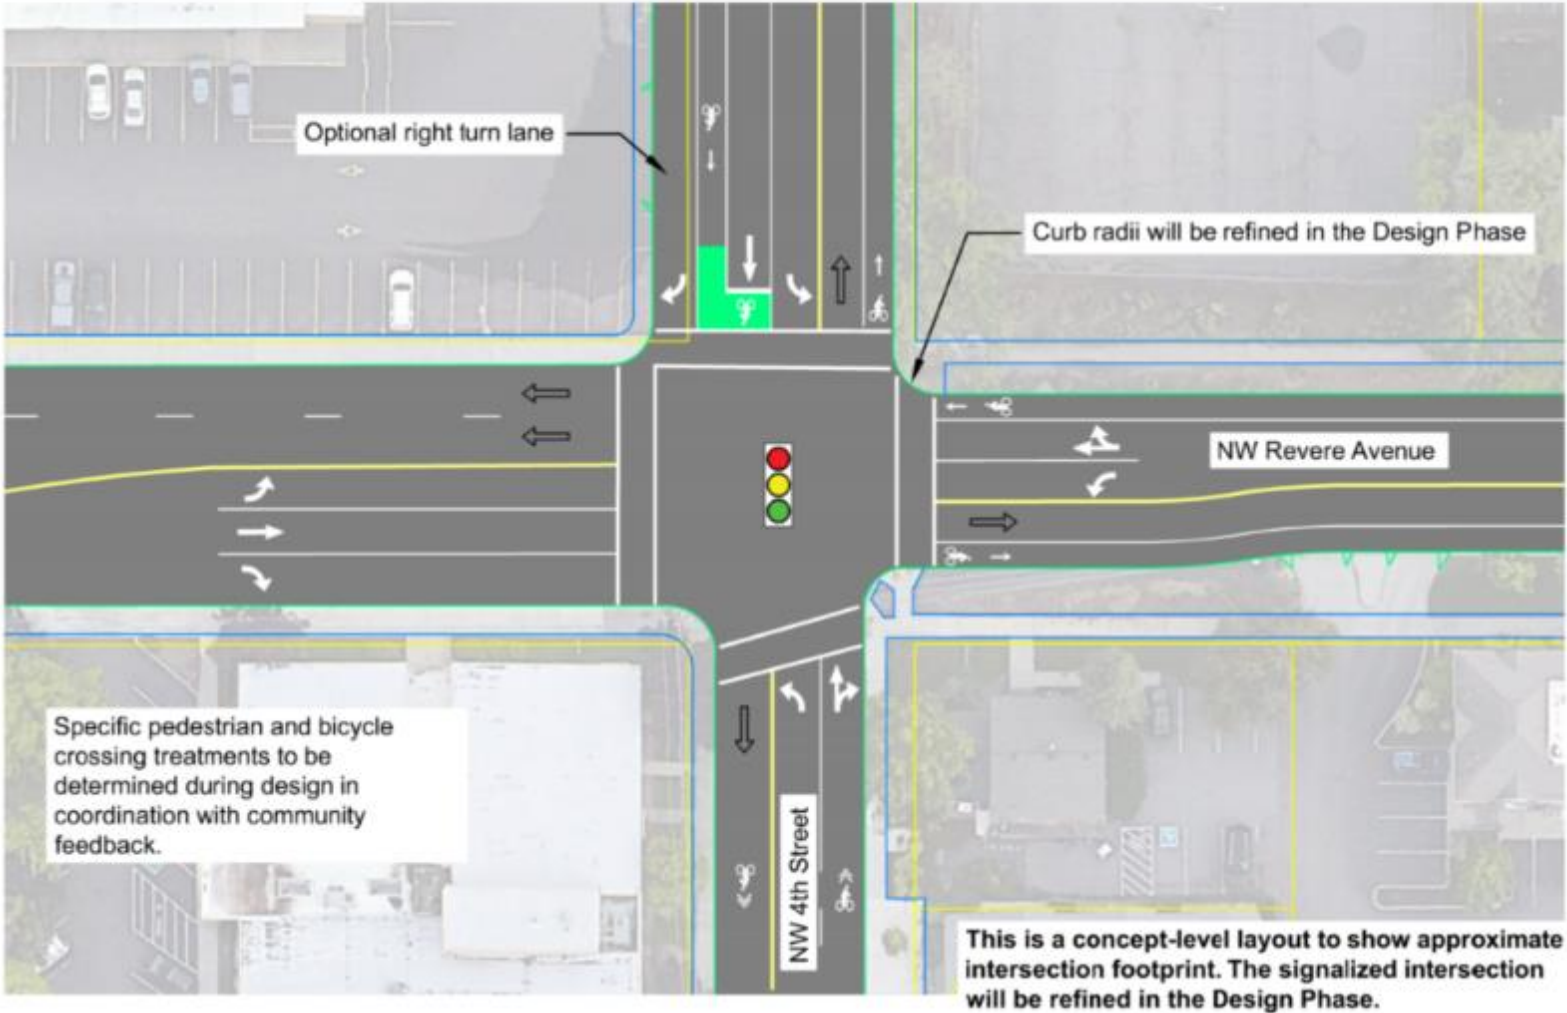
Proposed Signalized Intersection Layout at NE 4th Street and NE Revere Avenue
